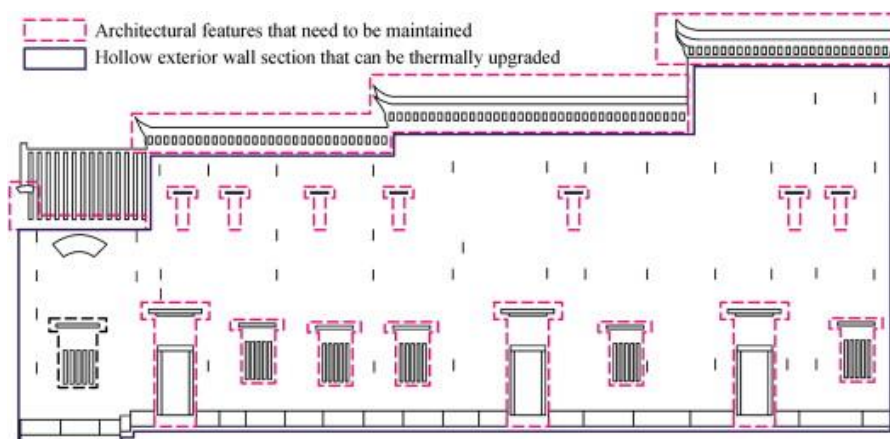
Elevation of a Hui-style exterior wall and its distinct architectural features
